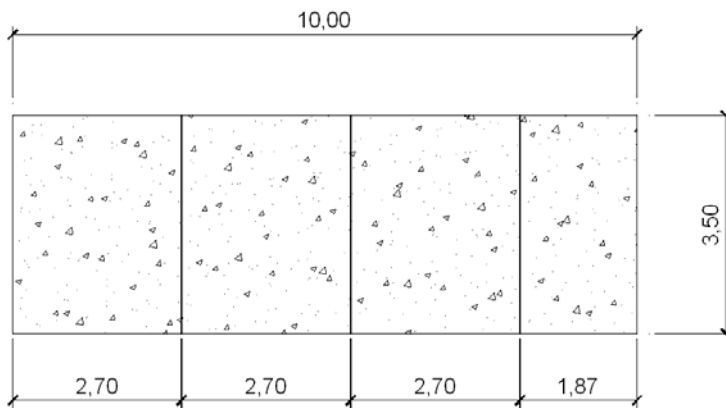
Maximum dimensions of facade panel (2,7 x 3,5 m) and wind load bearing wall (10,0 x 3,5 m)
